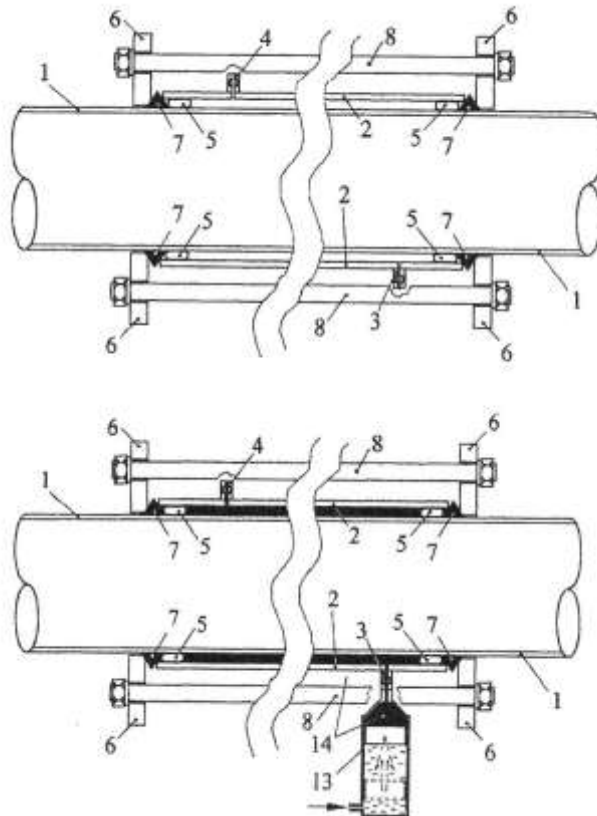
Method of pipeline defect repair with the use of folded sleeve and tightening flanges, pat. # 72840
